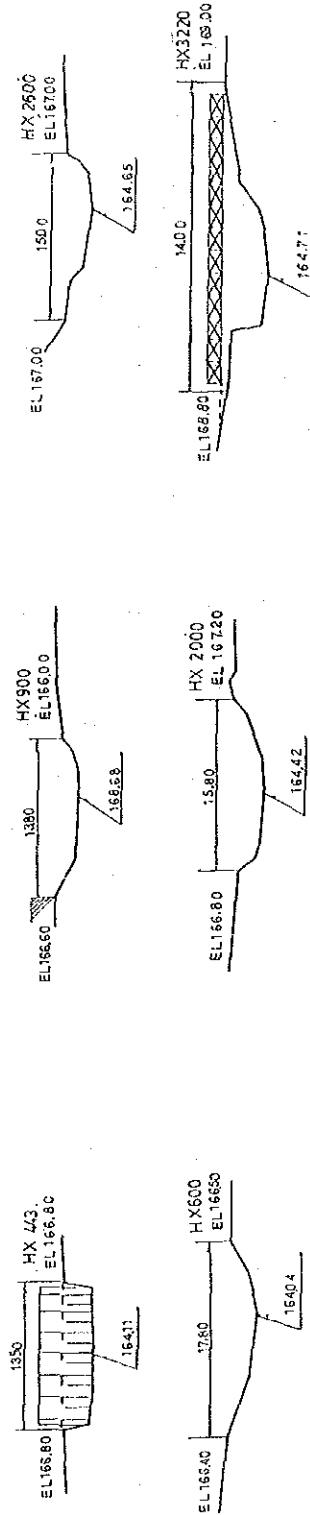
(4) Longitudinal Profile and Cross Section (Nam Pasak)
